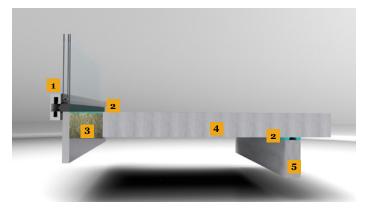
Curtain wall and fire-resistant floor and walls with indication of the use of fire resistant silicone for linear joints in compartments and on top of the mineral wool in the perimeter barrier system between floor and curtain wall.
